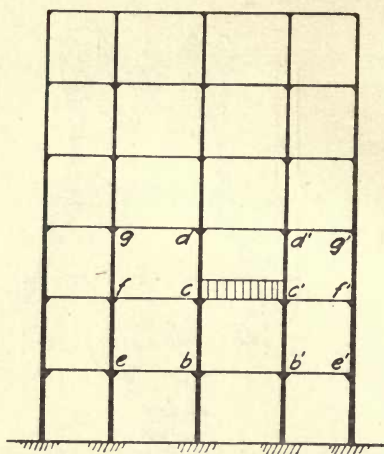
CROSS-SECTION OF BUILDING FRAME WITH SINGLE PANEL LOADED
